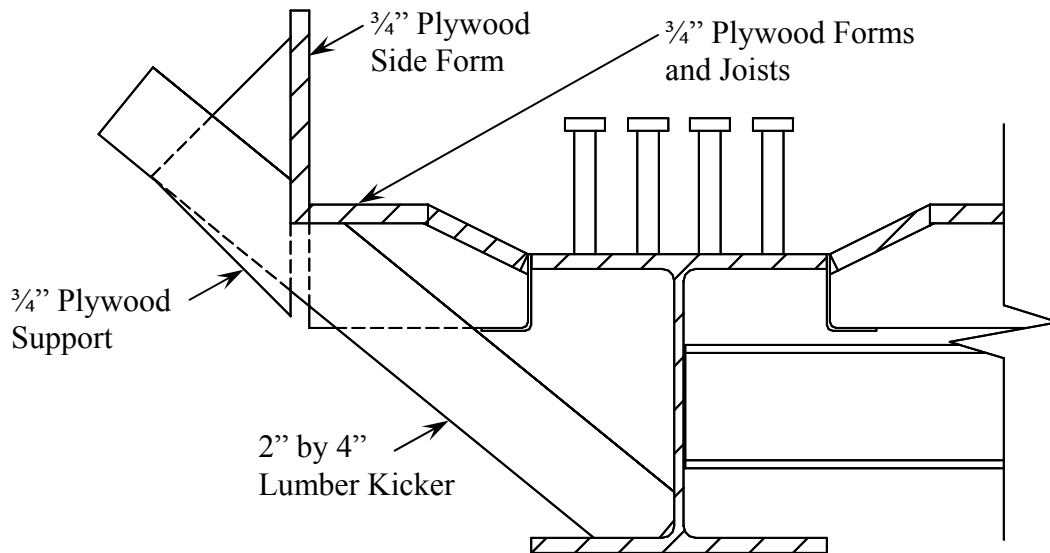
Kickers for Cantilevered Section of Free-Shrinkage Model
